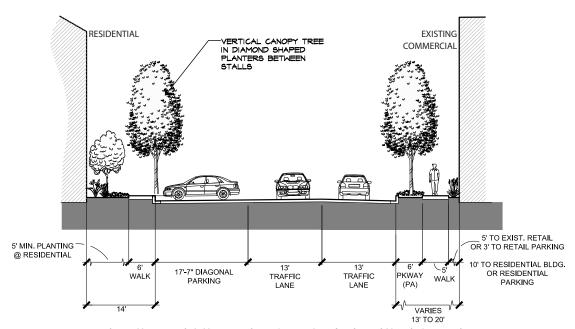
Via Alba - North Section (North of Via Villagio) Private Streetscape Section and Plan
